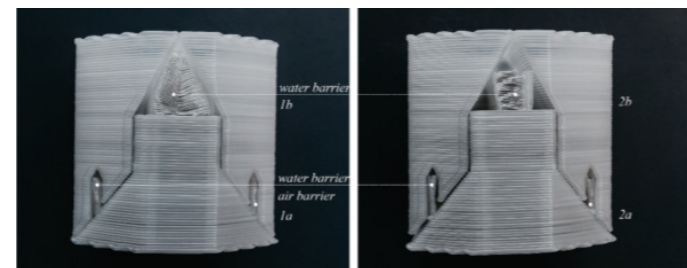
Façade panel connections, hybrid connection study for the vertical direction (Cheibas et al., 2022)
